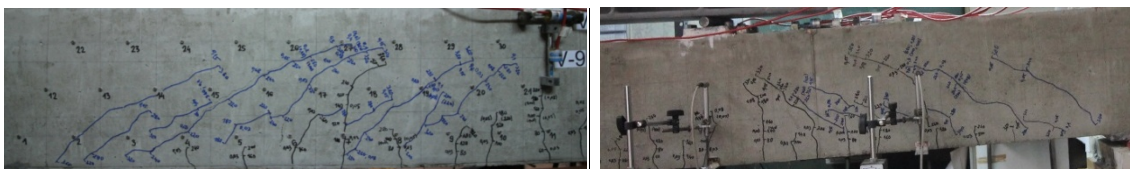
Crack pattern in a) the front side and b) the back side of the OPC-3 beam prior to failure
